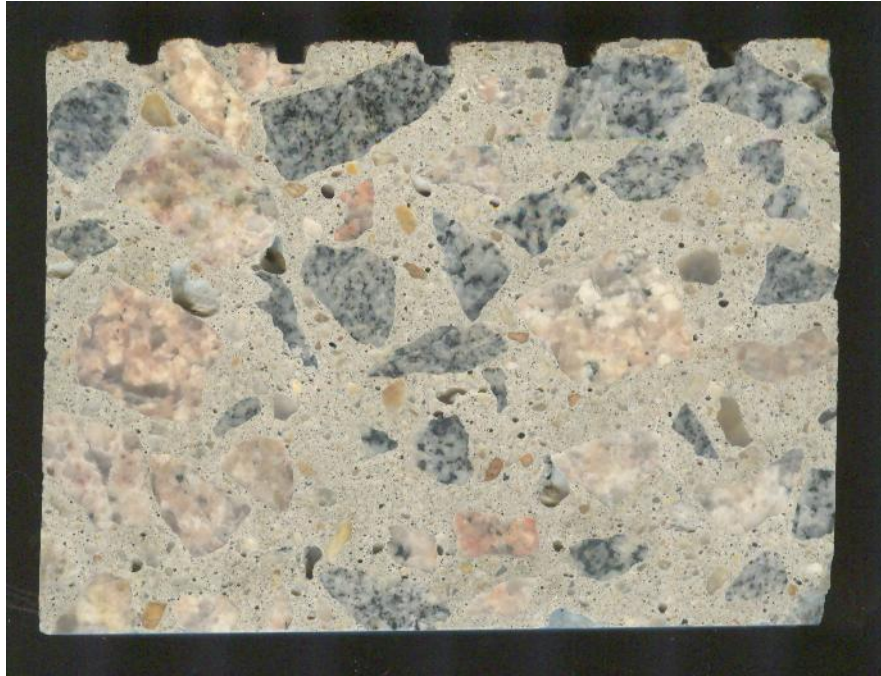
Scanned image of polished surface prepared from bridge deck 5N, core C-8. Bridge deck surface is at top.
